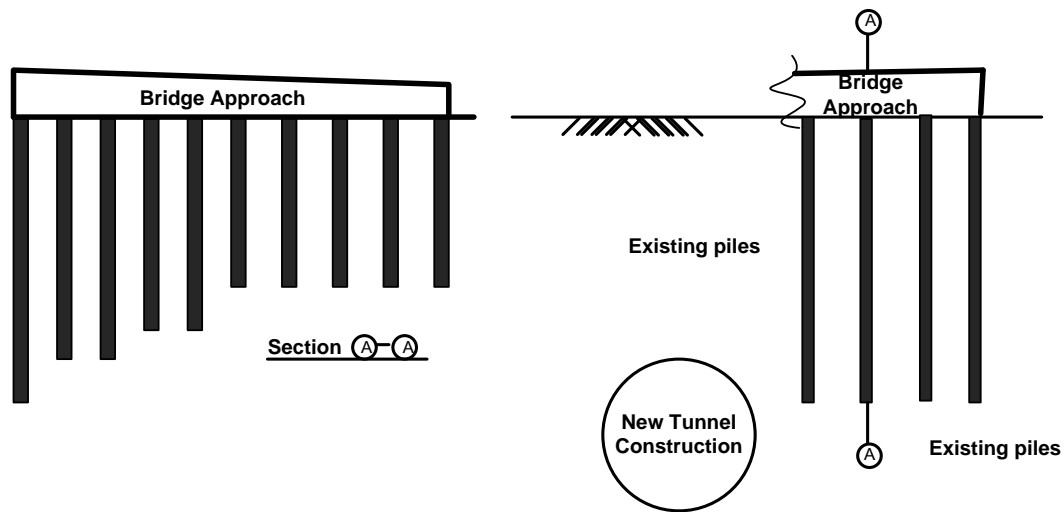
New tunnel construction nearby existing loaded piles of bridge approach
